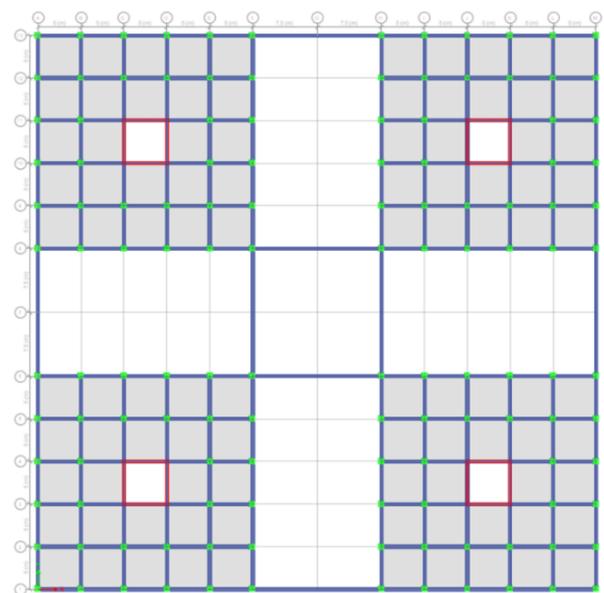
Typical floor plan of G+24 & G+29 Belt-truss building.
